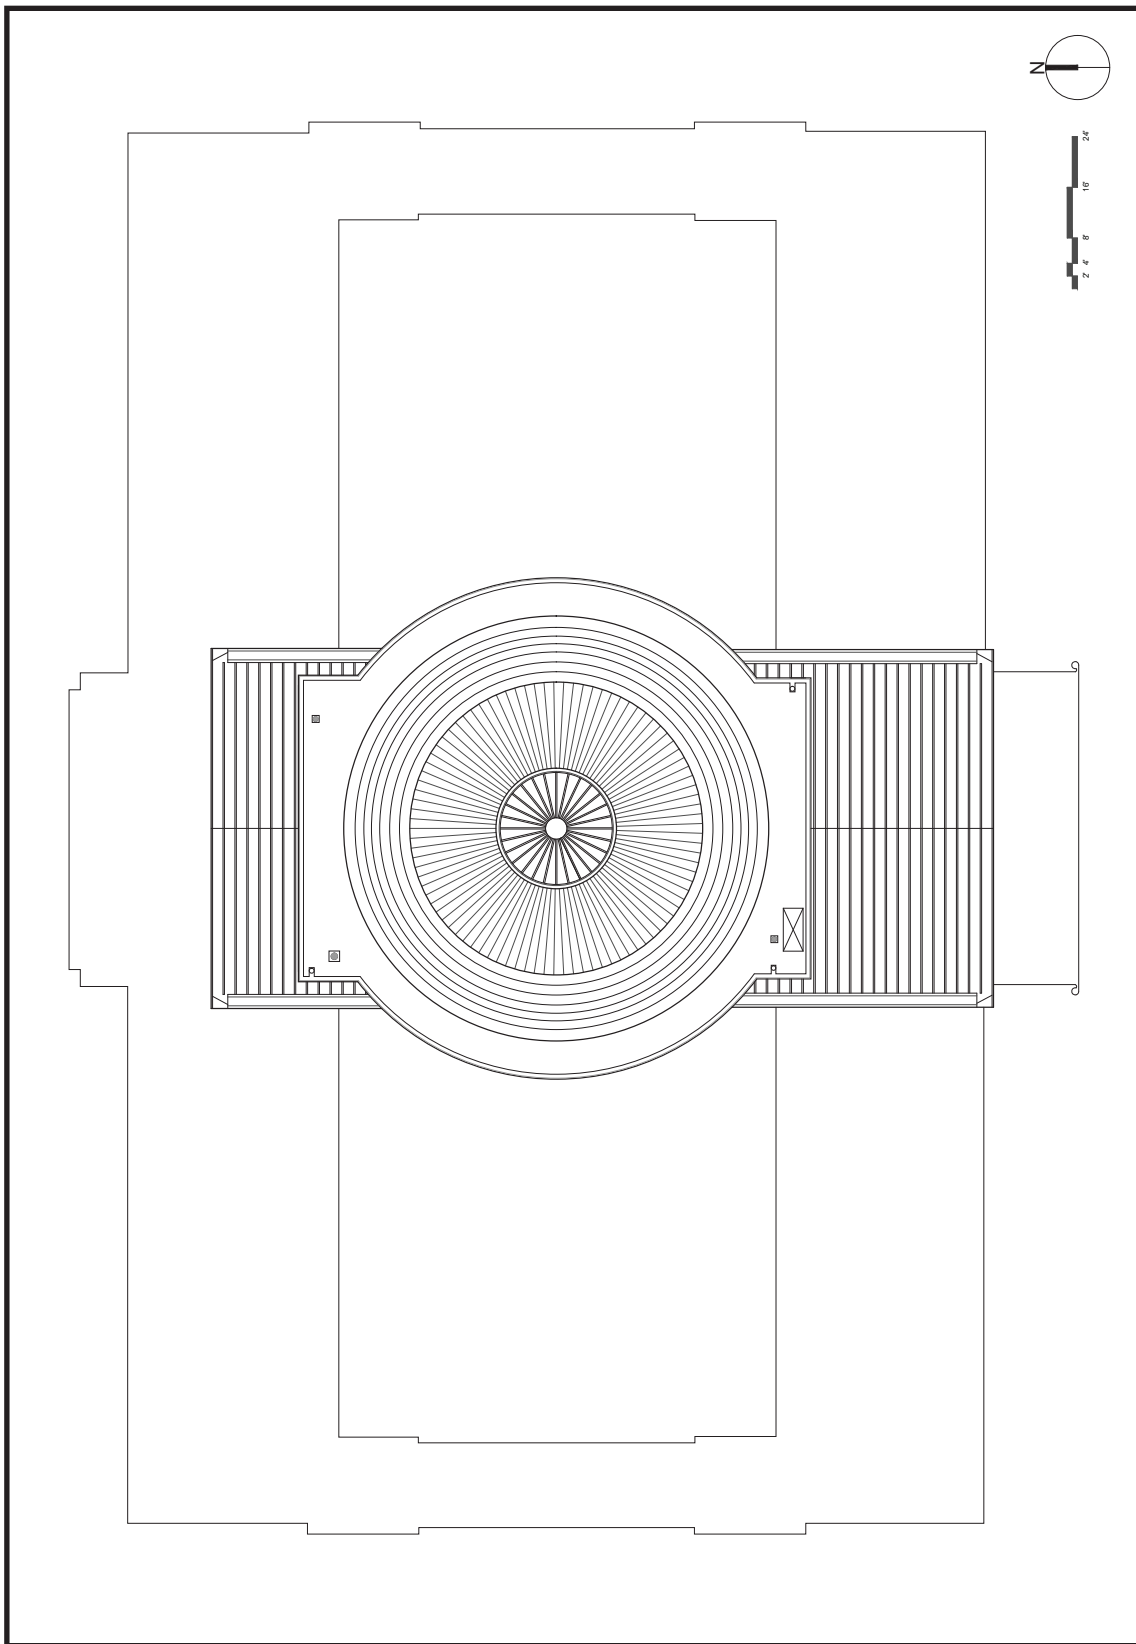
Roof plan. Drawing by John G. Waite Associates, Architects, 2022.
